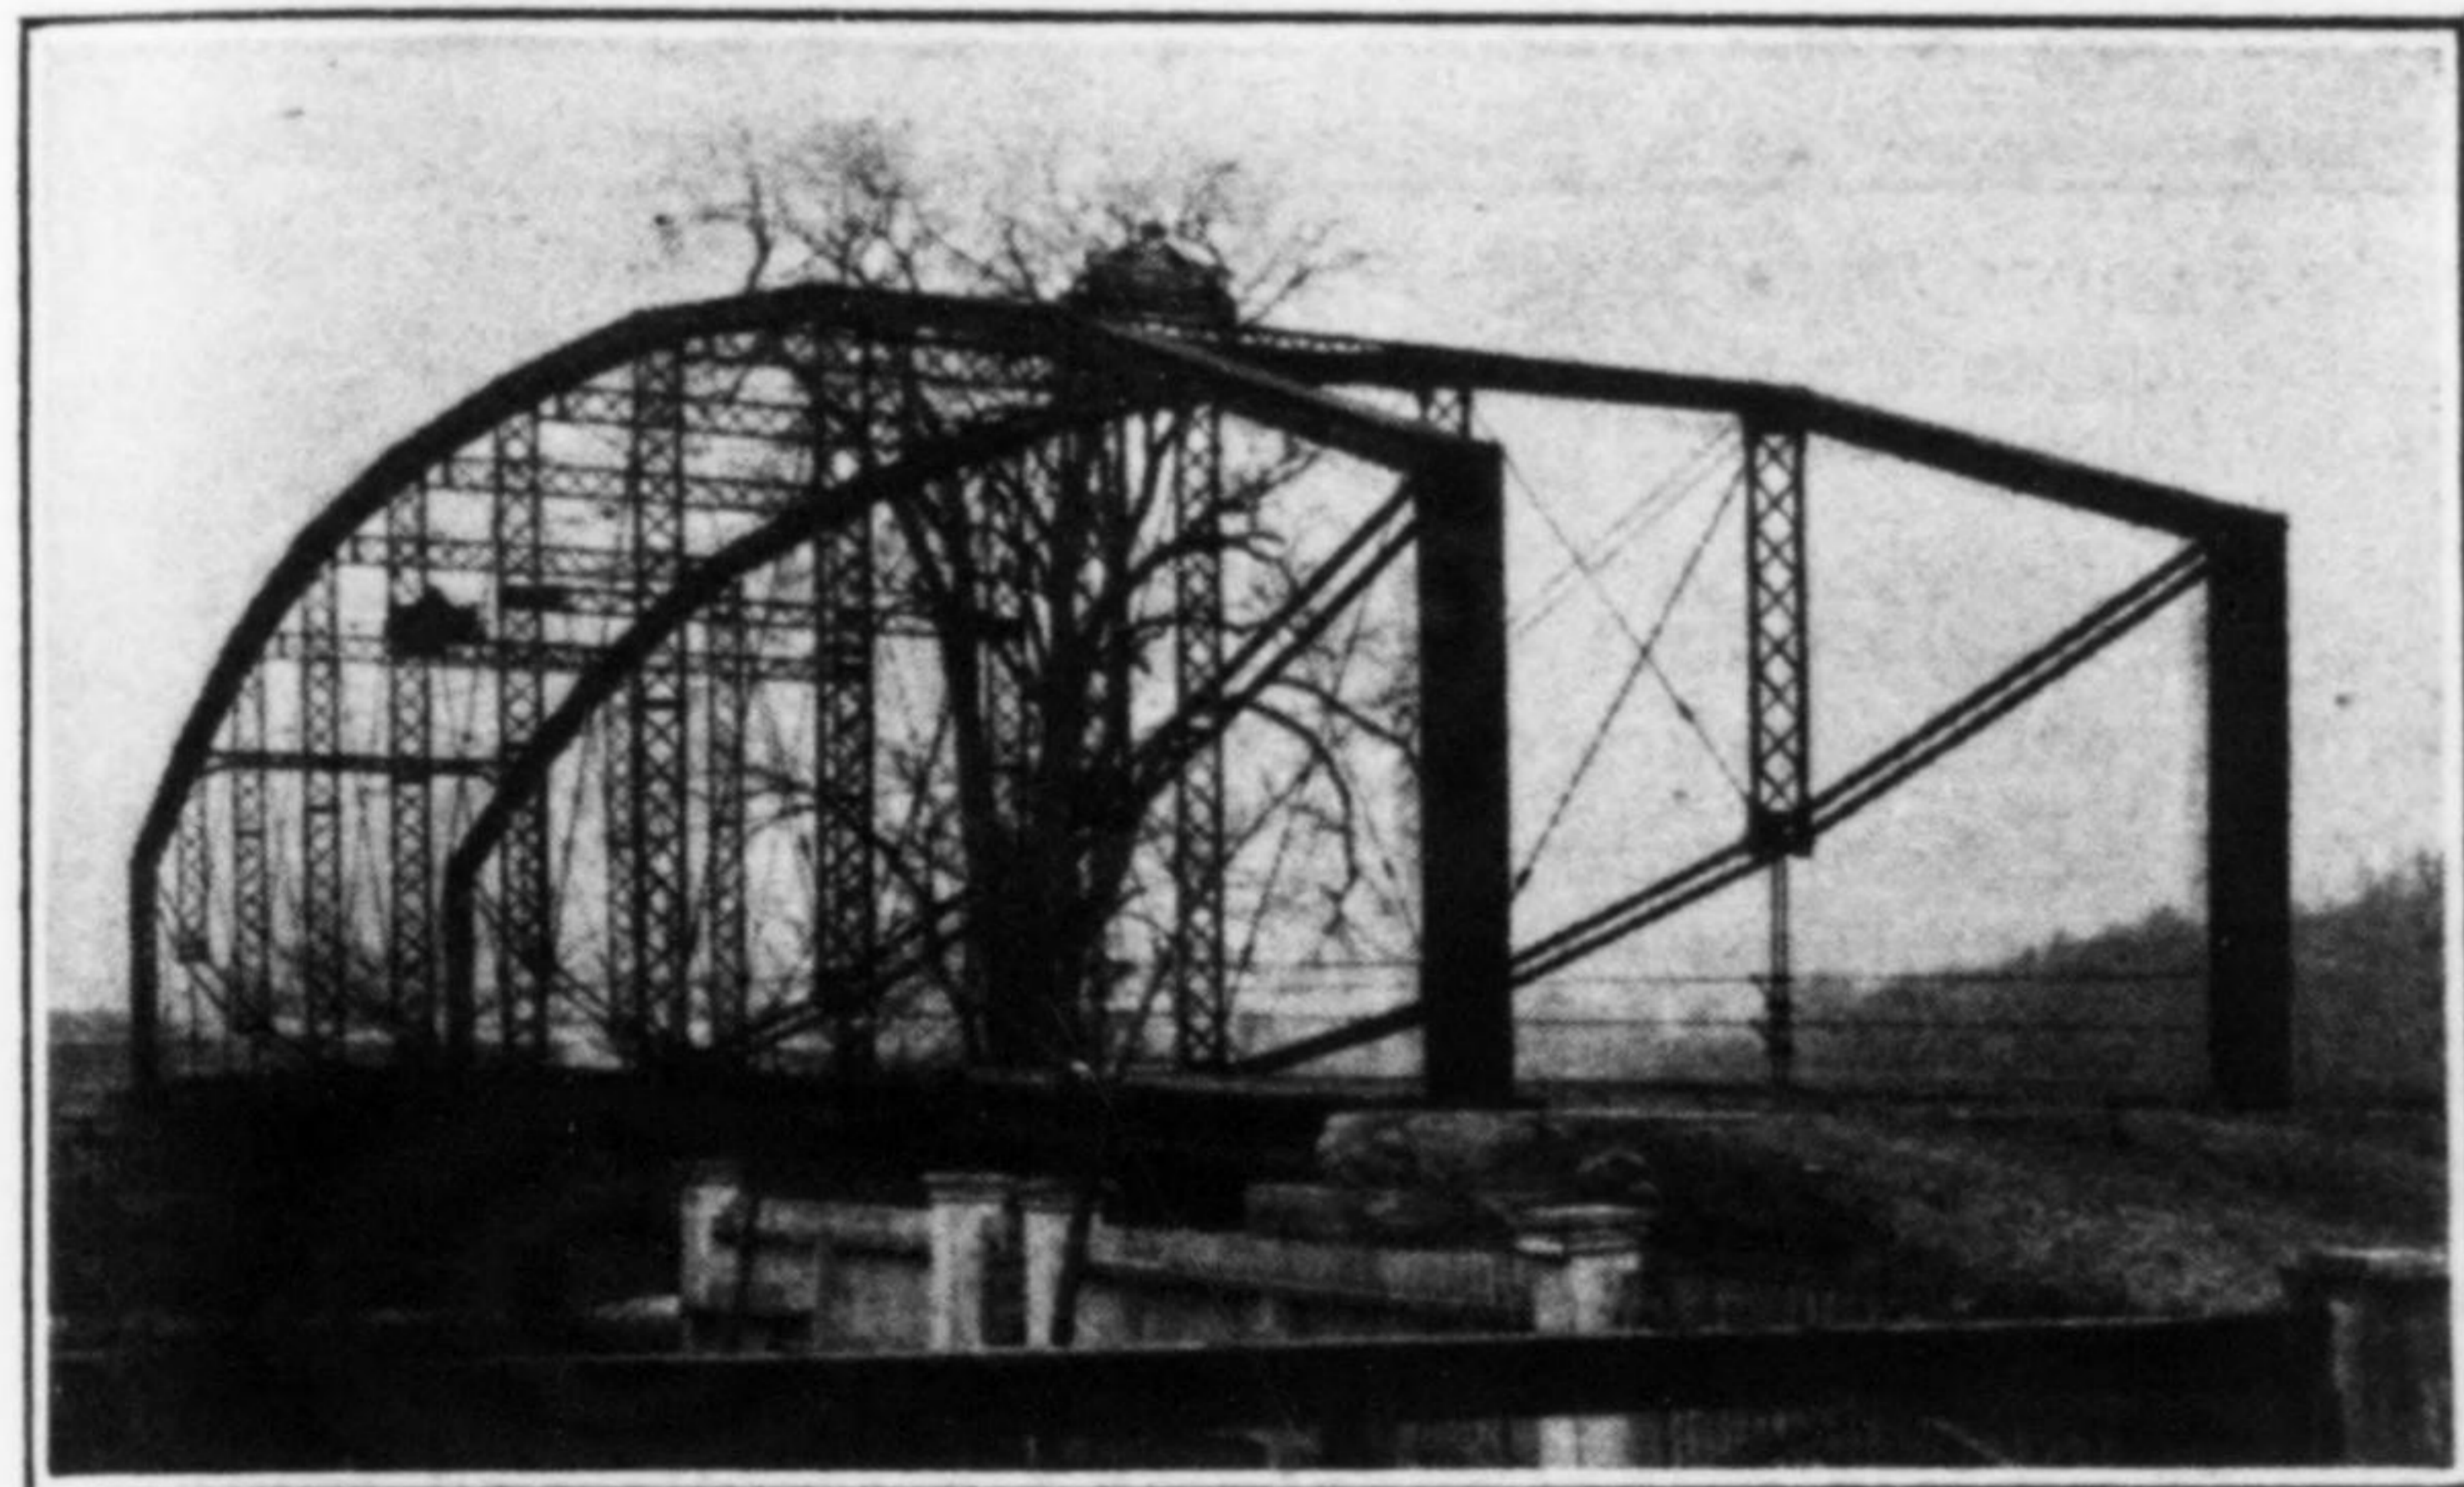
PARABOLIC TRUSS WITH PORTAL AT FIRST PANEL POINT
